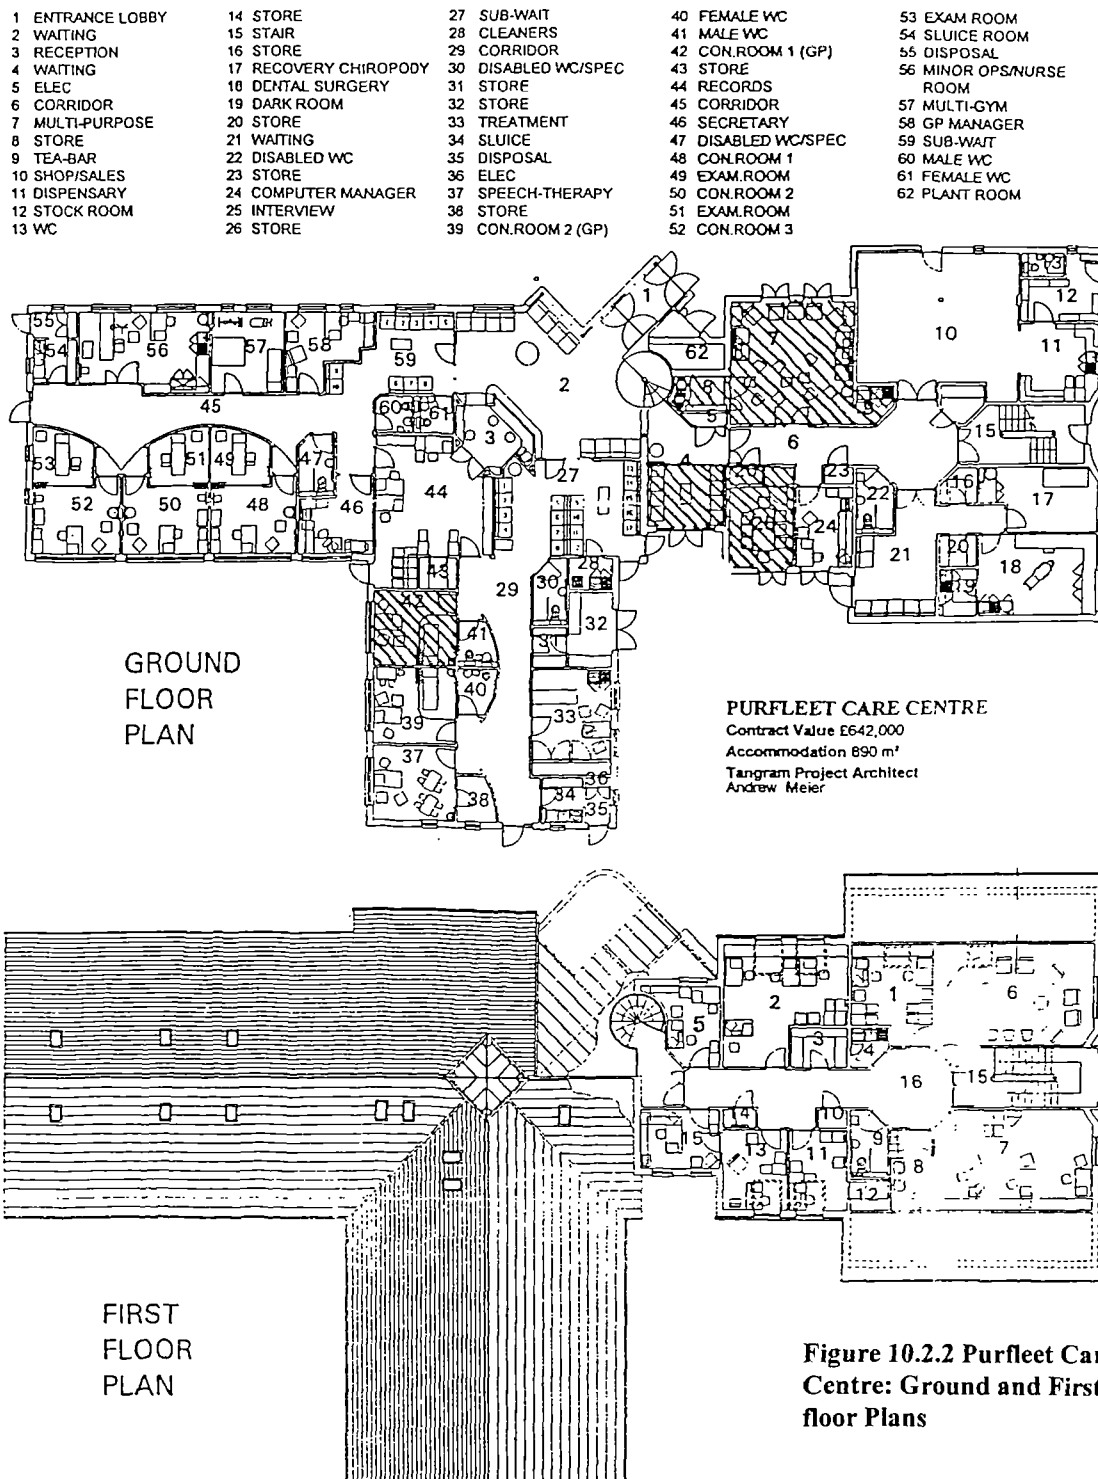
Purfleet Care Centre: Ground and First floor Plans
